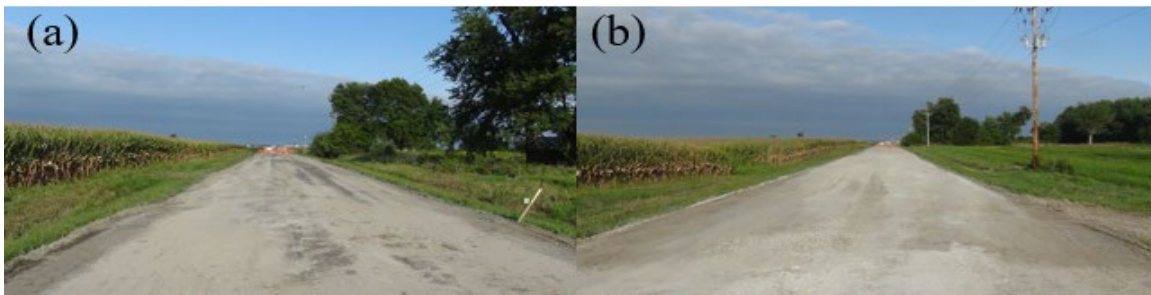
(a) Cement-treated surface section and (b) cement-treated subgrade section in Washington County at end of construction
